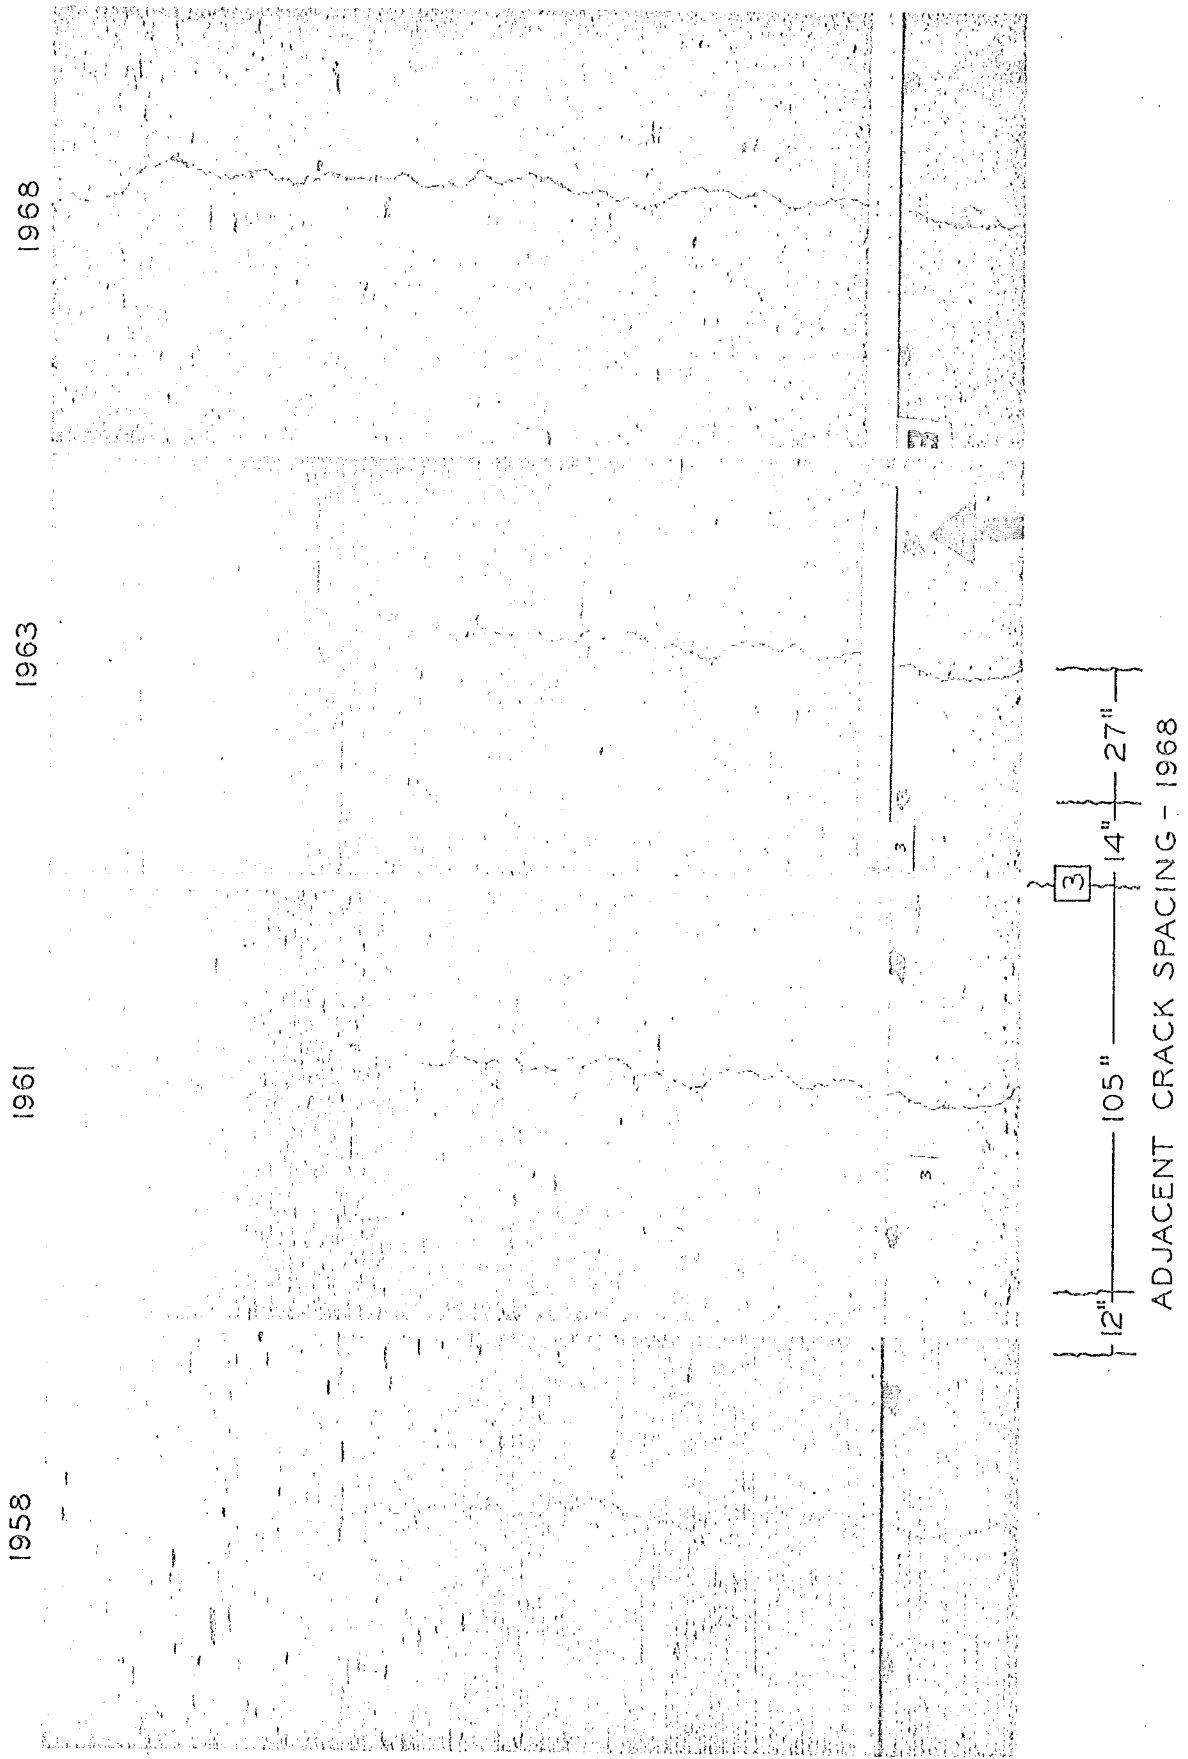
Transverse crack in bar mat section 500 ft from free end.
